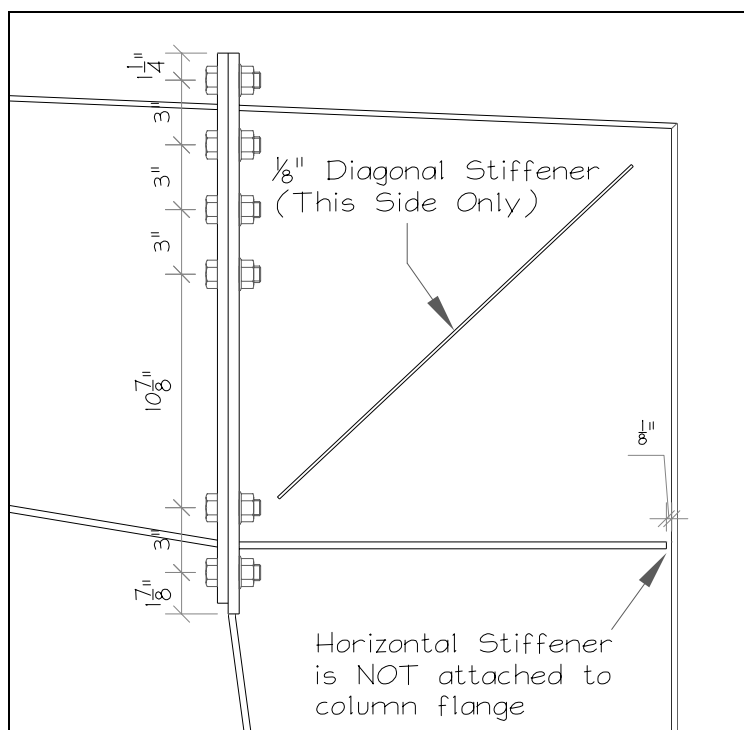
Frame 4, diagonal stiffener and the horizontal stiffener is detached
